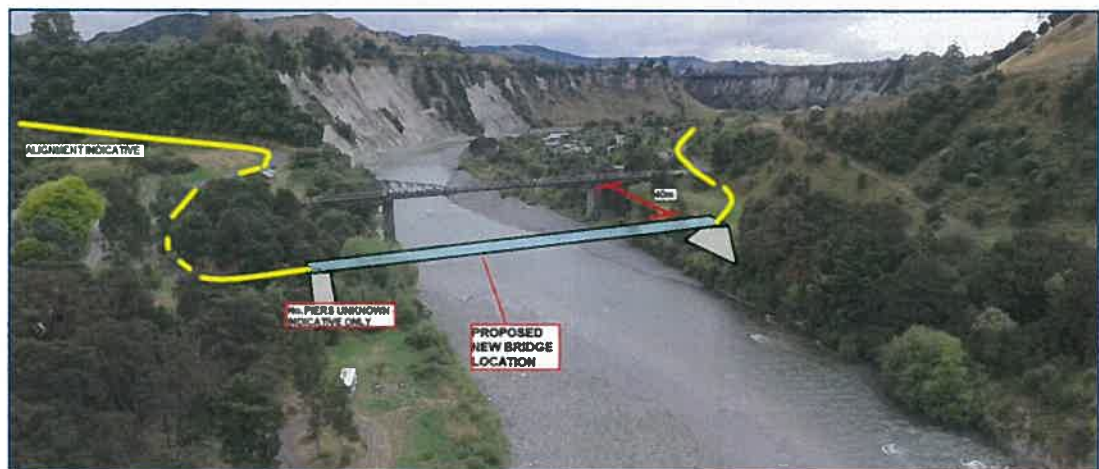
Potential New Bridge Alignment (Downstream of existing)
